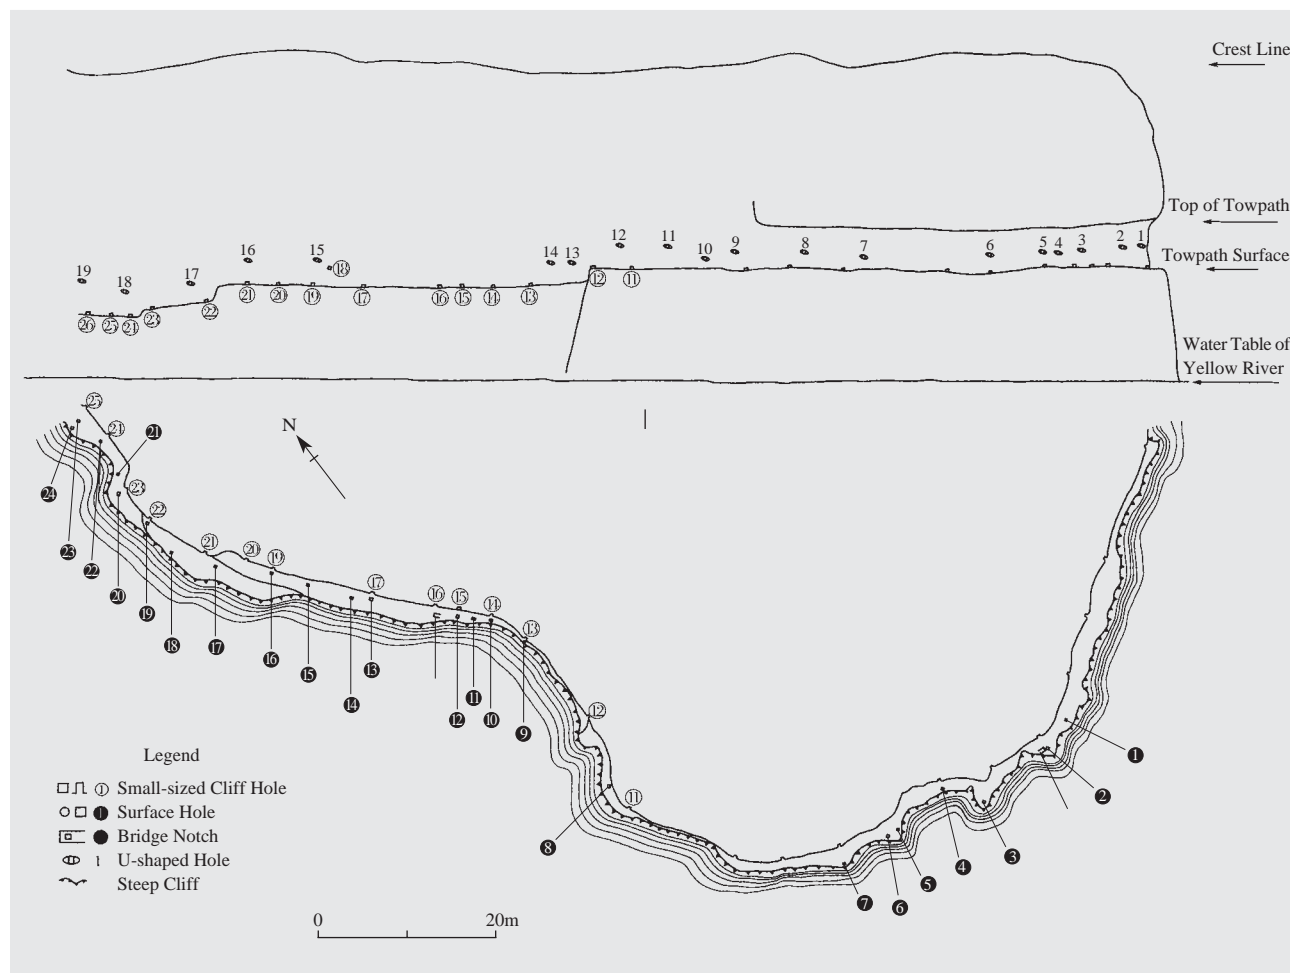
The Elevation and Plan of Towpath Remains of Section Four
